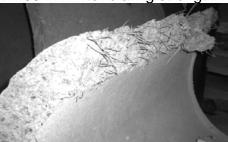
Uniform distribution of steel fibers in terms of concrete wall in turn stalefibrobetonnoy pipe.
